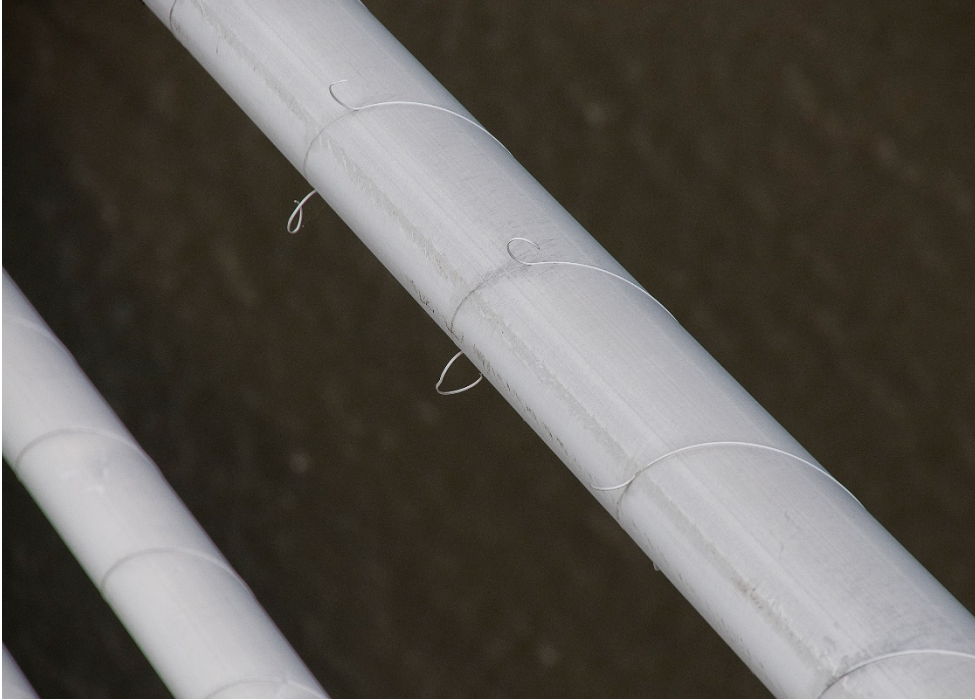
Ribbing Detaching from Stay Pipe near Tower Anchorage (2013).
